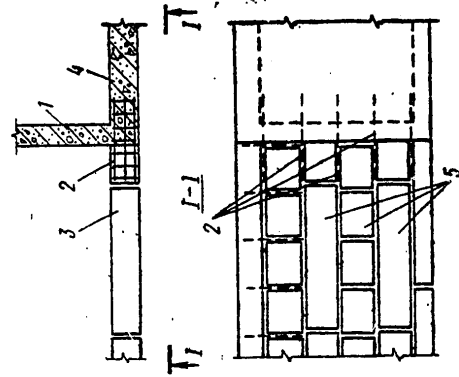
Joints of walls of precast elements and monolithic reinforced concrete
